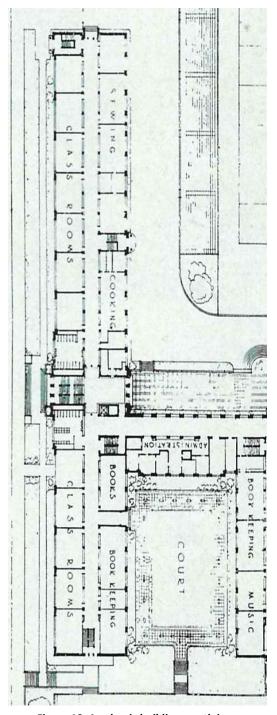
Academic building; north is up. Source: Architect and Engineer (April 1936)
